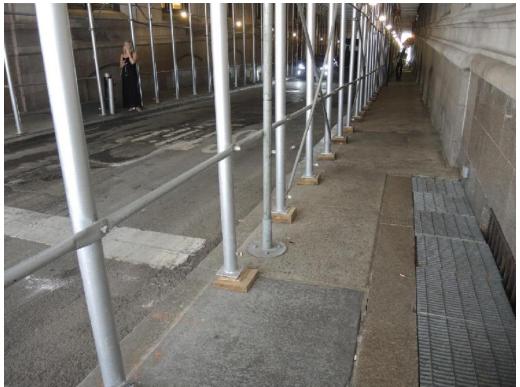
Thames Street at Trinity Place with sidewalk shed scaffolding. View looking southeast.
